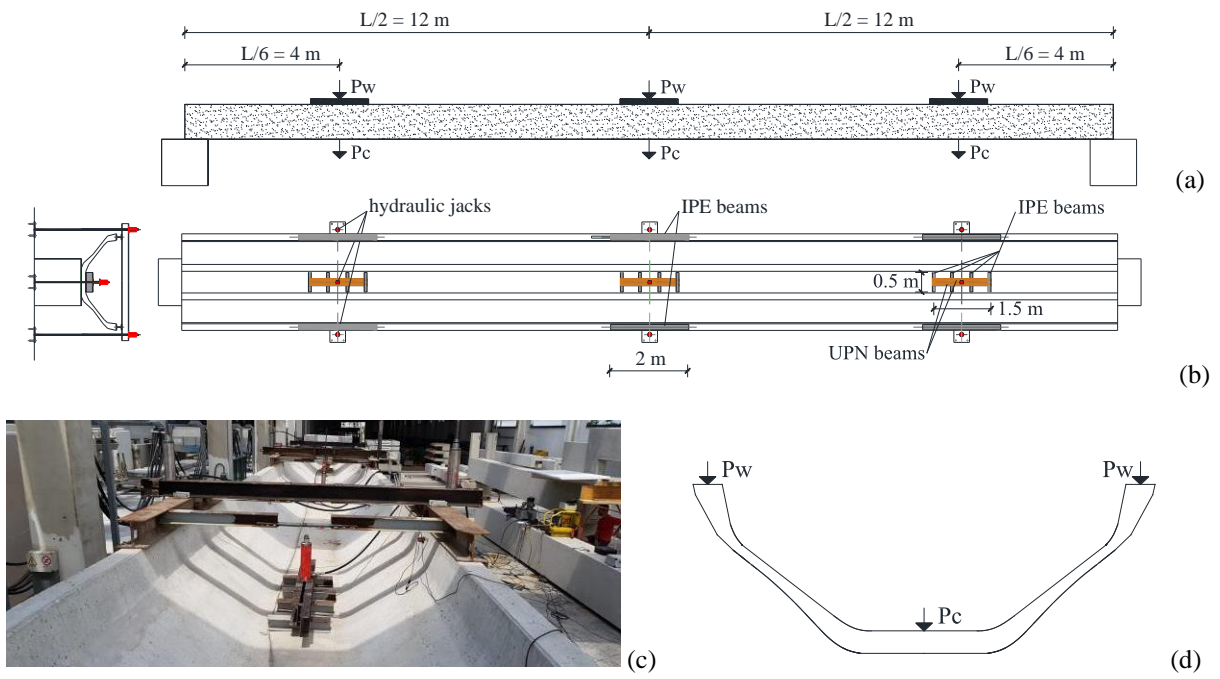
Sketch of the loading arrangement: (a) lateral view; (b) top and transverse views; (c), (d) detail of the load application system in the transverse cross section.
